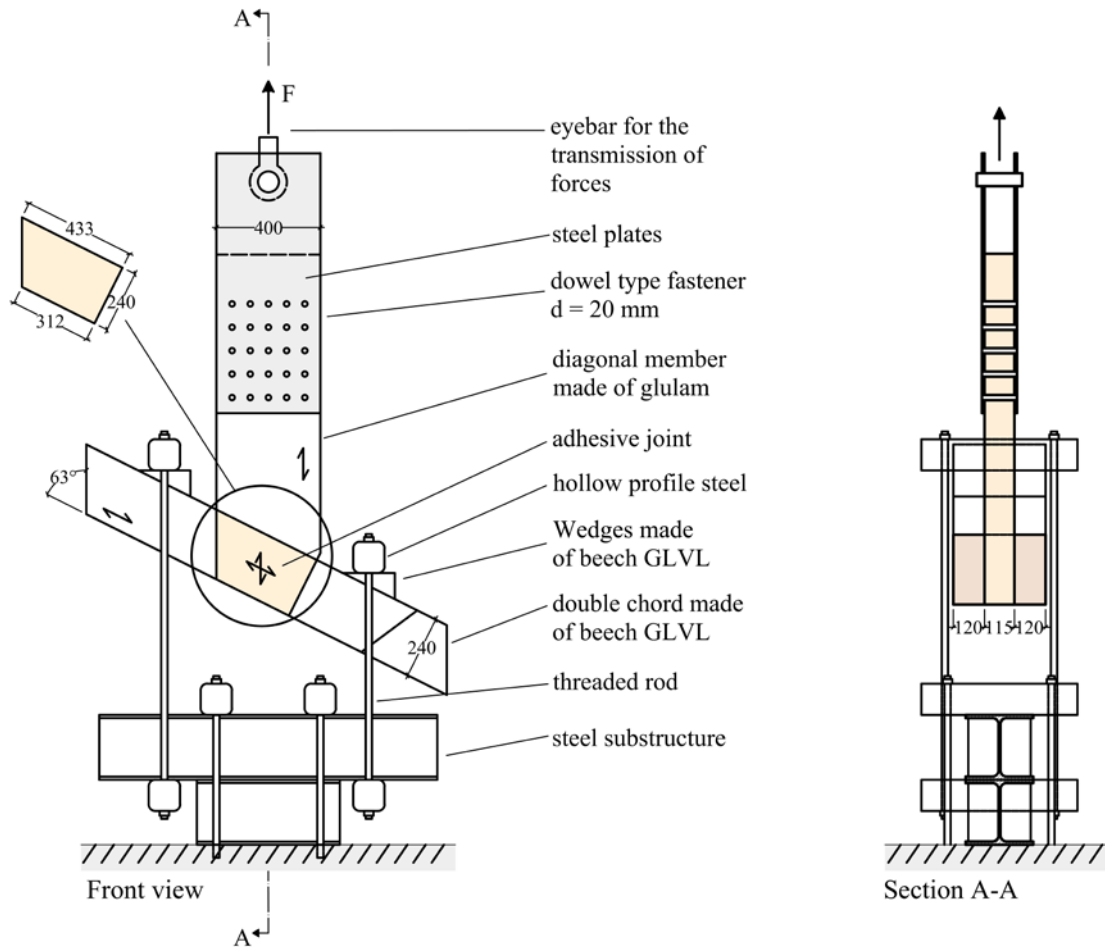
Scheme and dimensions of experimental set-up for tensile shear test of the investigated truss joint
